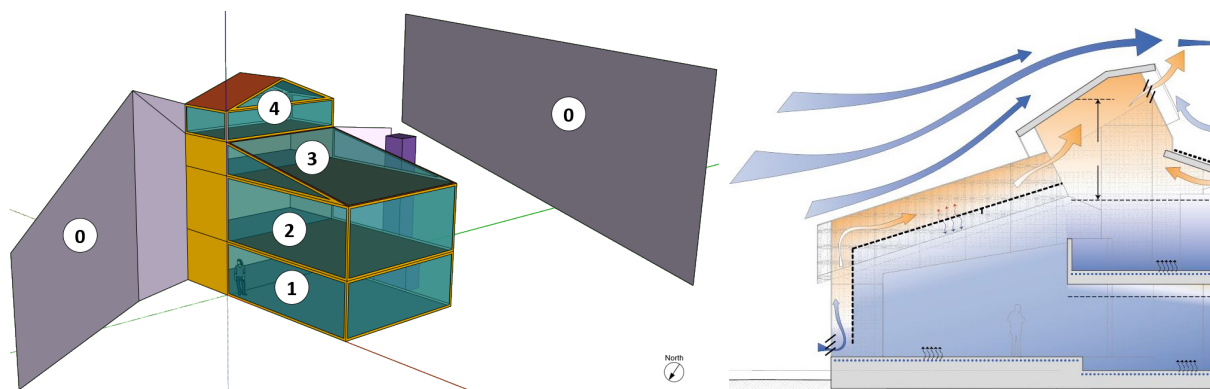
Simulated wing stratification (left) and heat gains flushing by ventilation (right) in the internal fully open building; 0 – shading buildings, 1 – zone bottom, 2 – zone middle, 3 – zone roof, 4 – zone air hat
